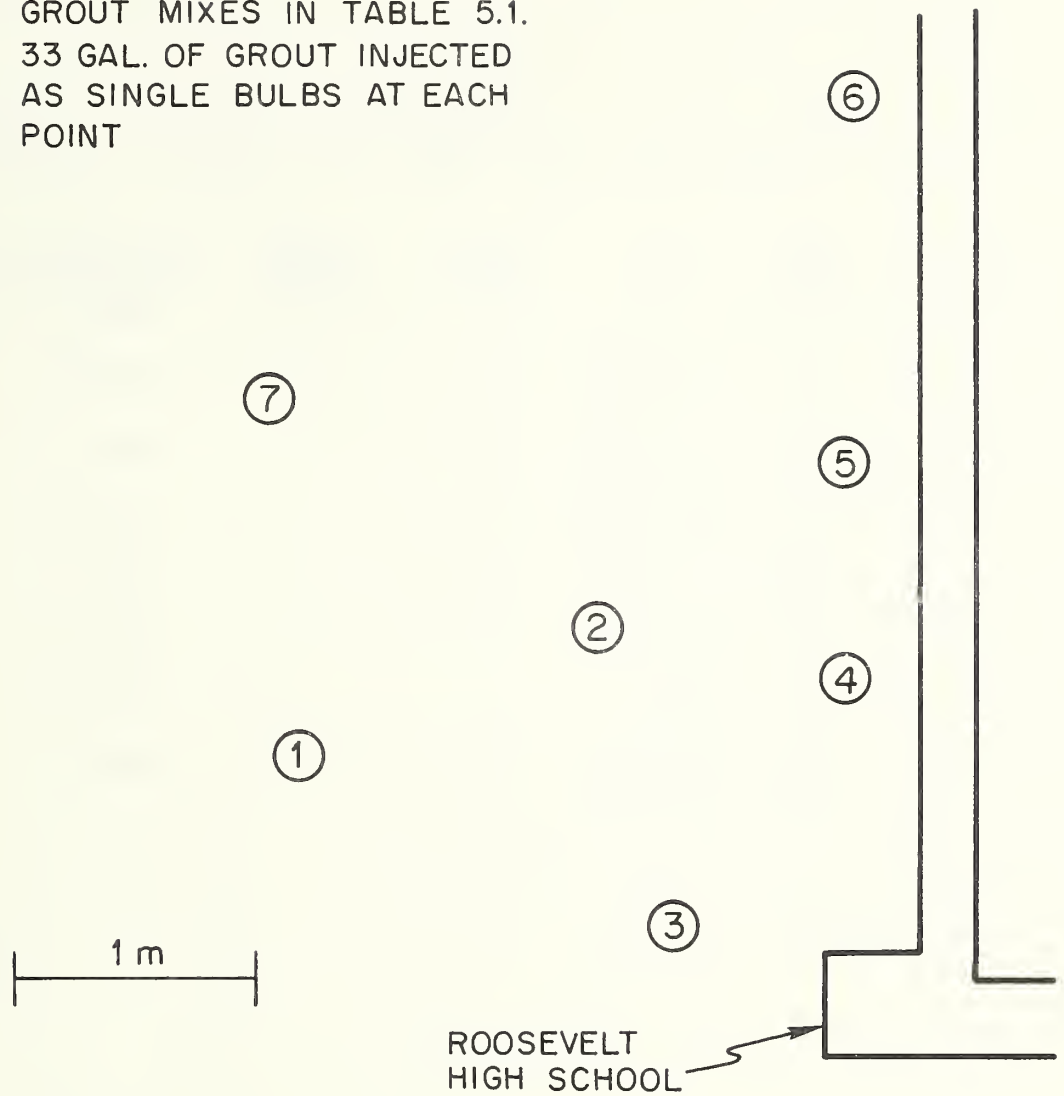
LAYOUT OF TEST INJECTIONS, ROOSEVELT HIGH SCHOOL SITE
